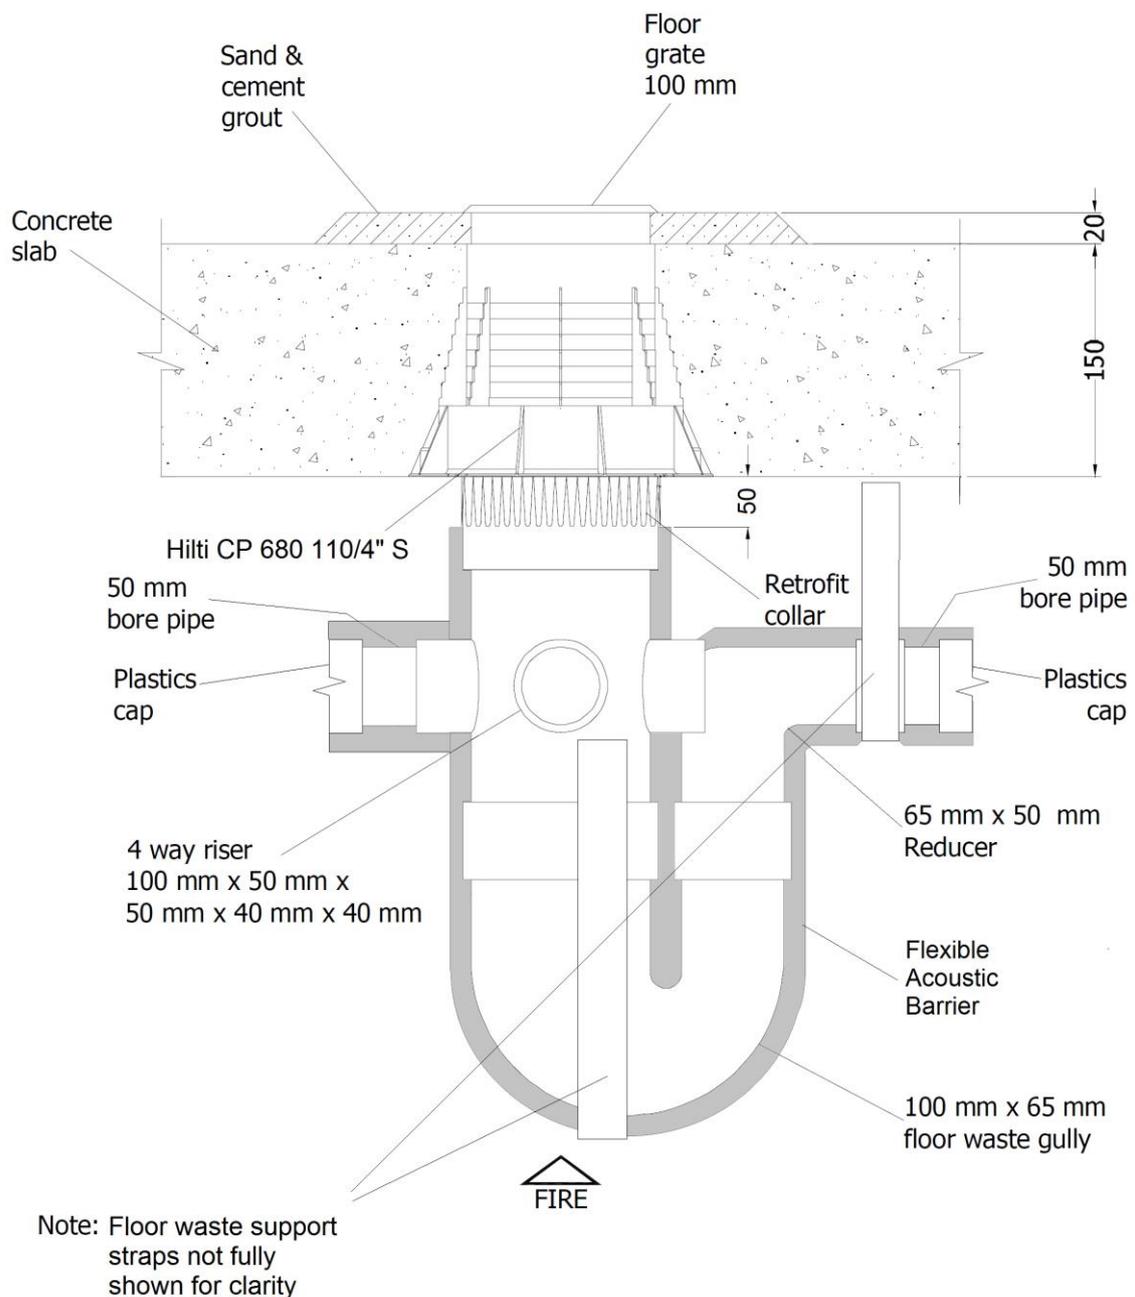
uPVC floor waste – gully pipe protected with Hilti CP 680 110/4\" S and Hilti CP 680 110/4\" N-RAD without Ultrafloor, optional flexible acoustic barrier at least 50mm from underside of concrete slab
